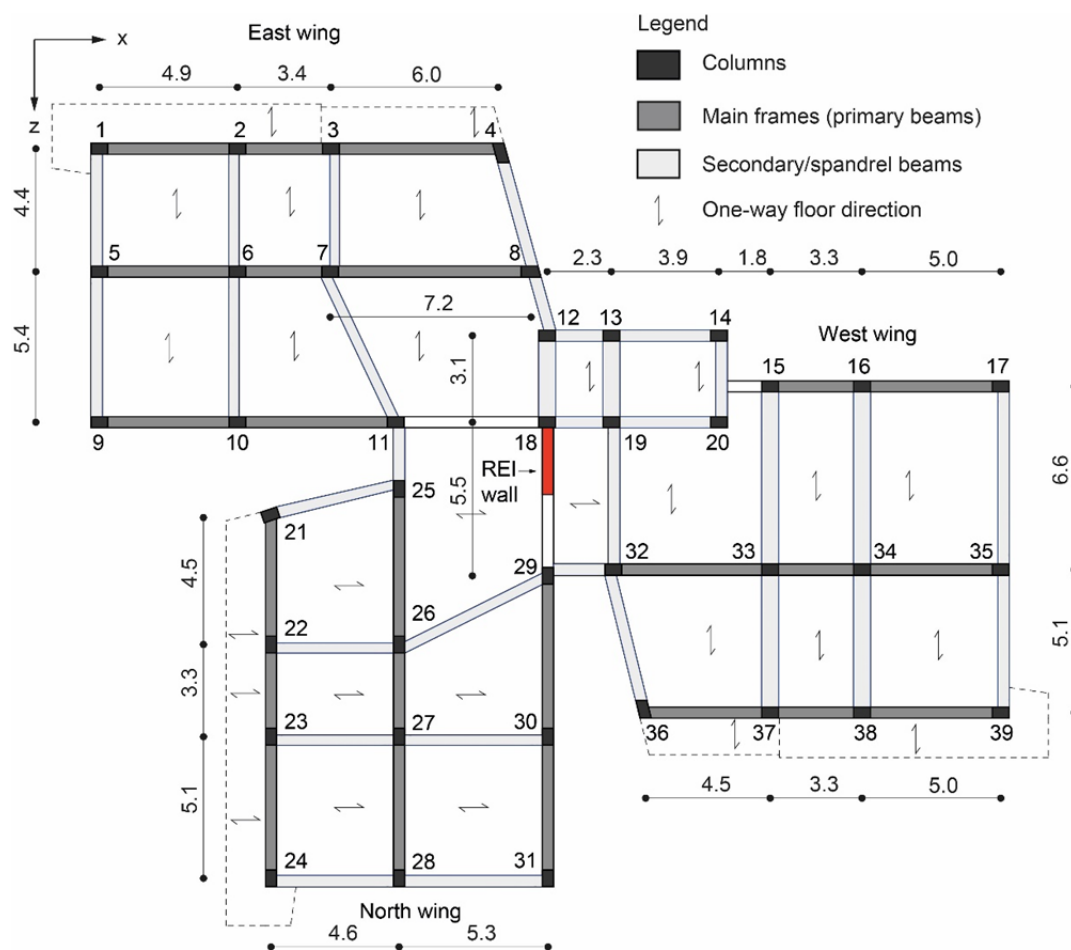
Structural plan layout of a typical residential floor and column numbering, units: m. (after [7])
